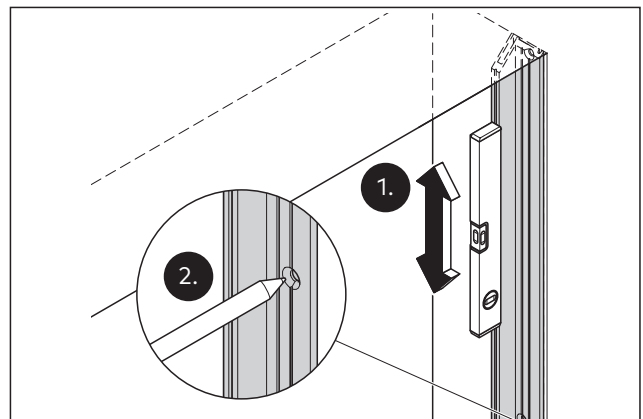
Mark all of the door frame adapter's drill holes on the ground
